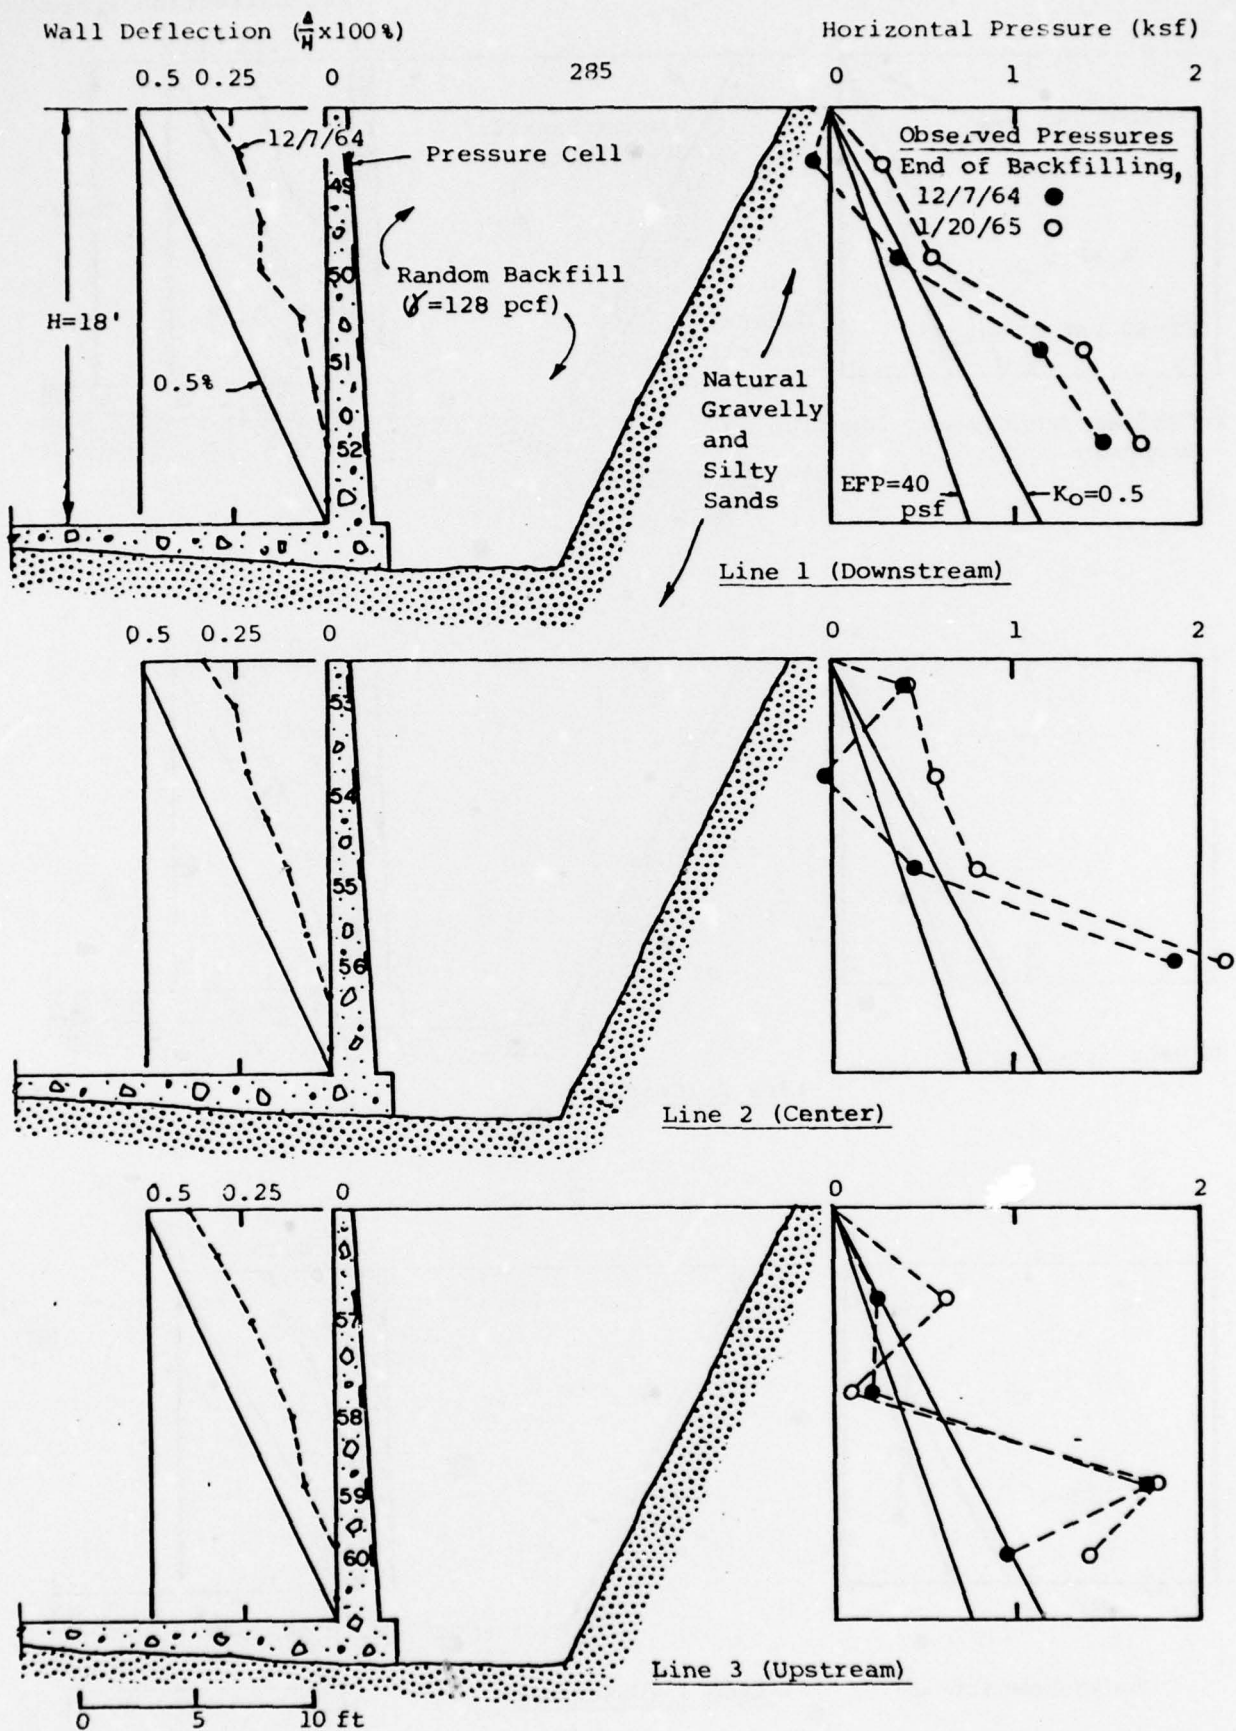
EARTH PRESSURES AND WALL DEFLECTIONS AFTER BACKFILLING, WALL PANEL B, (STA. 116+00), SAN JOSE CREEK CHANNEL
